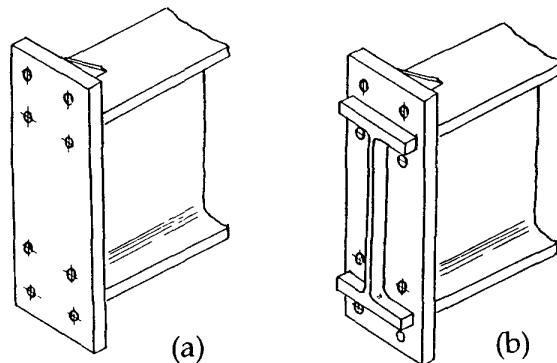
Standard and Innovative Pre-stressed End Plate Connections (Astaneh-Asl, 1986)
